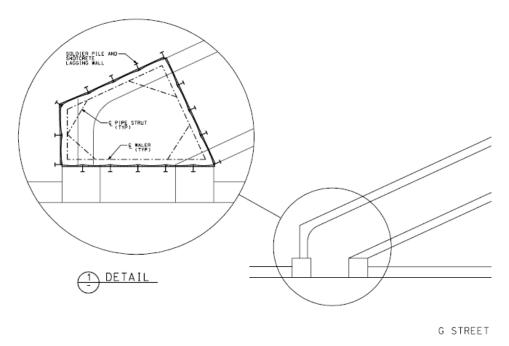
Forepoling and Typical Plan for Proposed Tunnel
